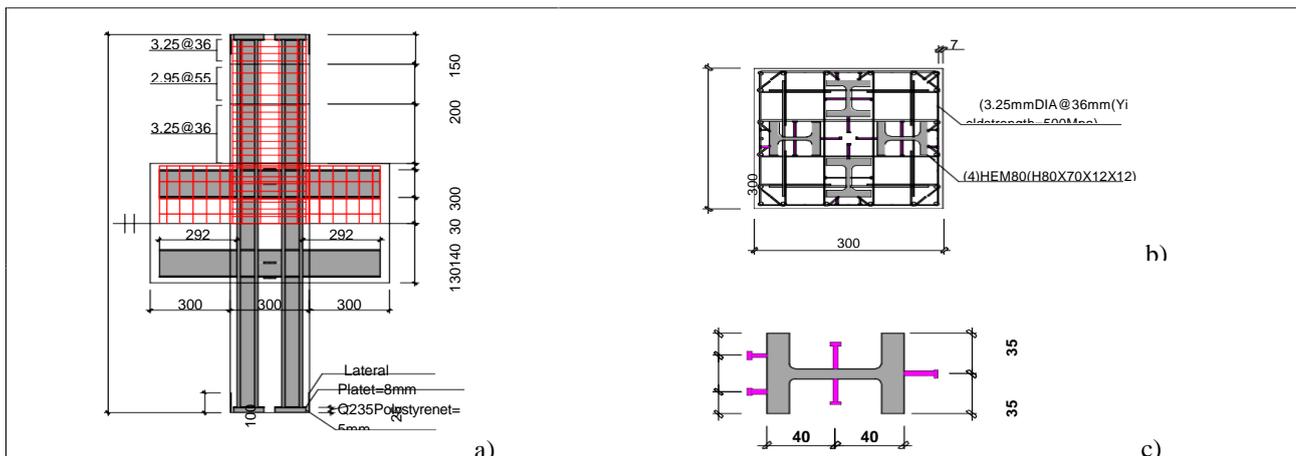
Phase2:Quasi-statictests:a)steellayout–longitudinal;b)steellayout–crosssection;c)shearstudslayout.
